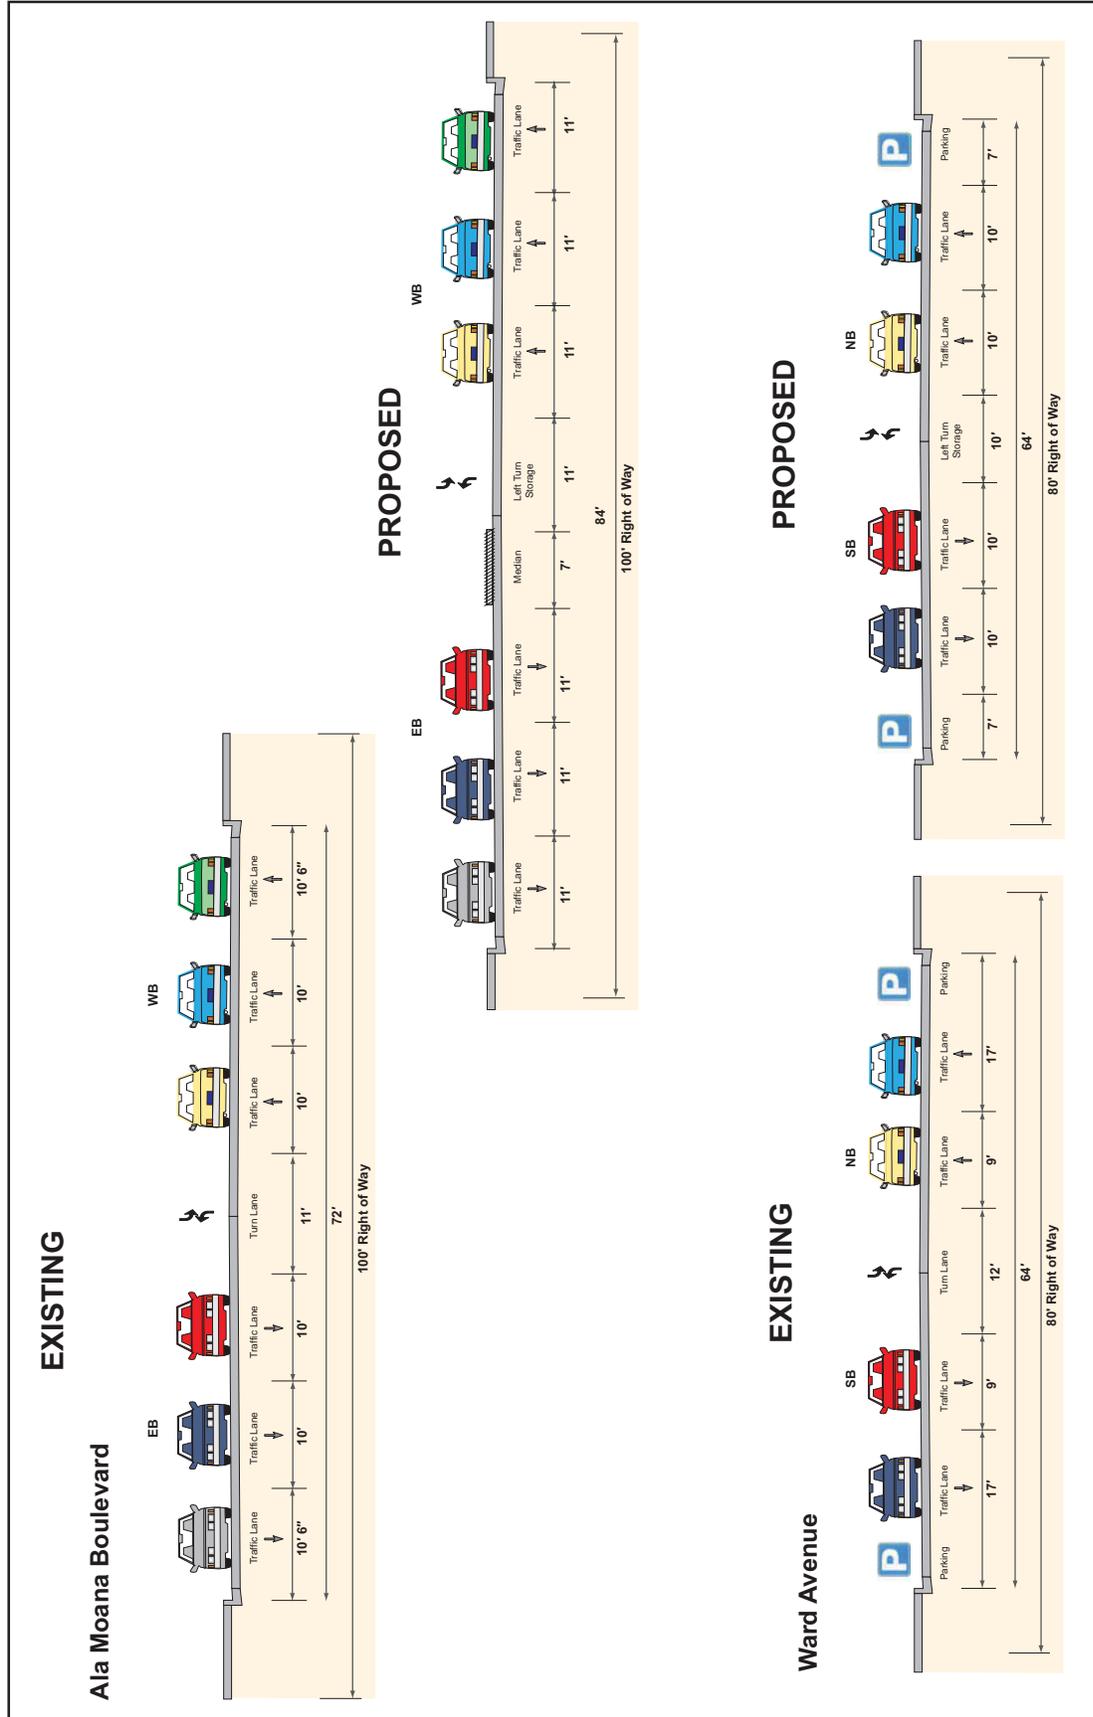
Draft Mauka Plan Roadway Cross Sections
